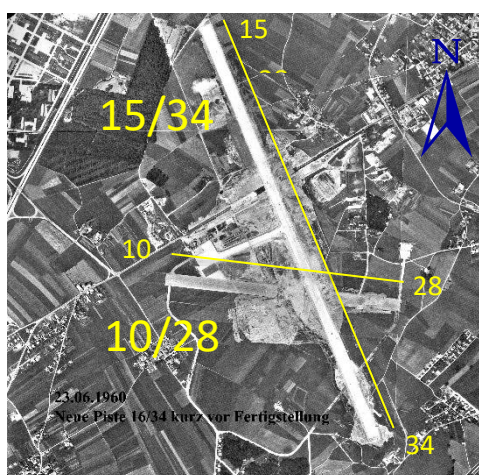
aerial view of Salzburg runways with WW2 runway being deconstructed
